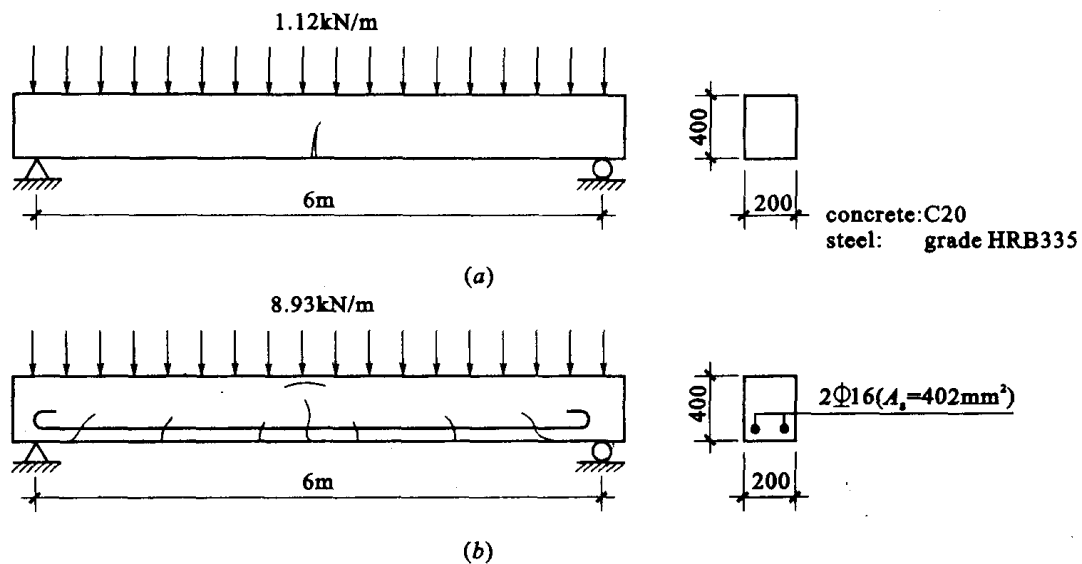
A comparison of concrete beam with reinforced beam of the concrete column.
